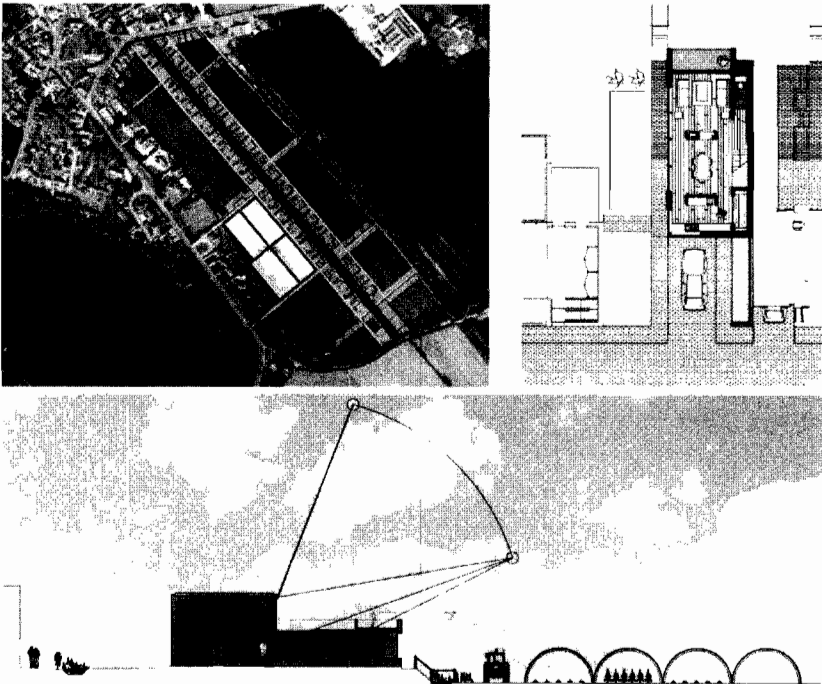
Scenario 3: Street. Site plan, house plan and section.
